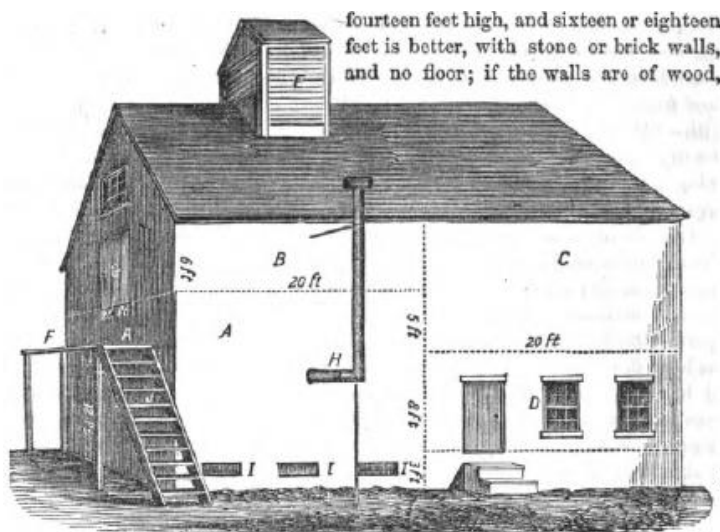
ELEVATION OF THE COMMON HOP-KILN.
